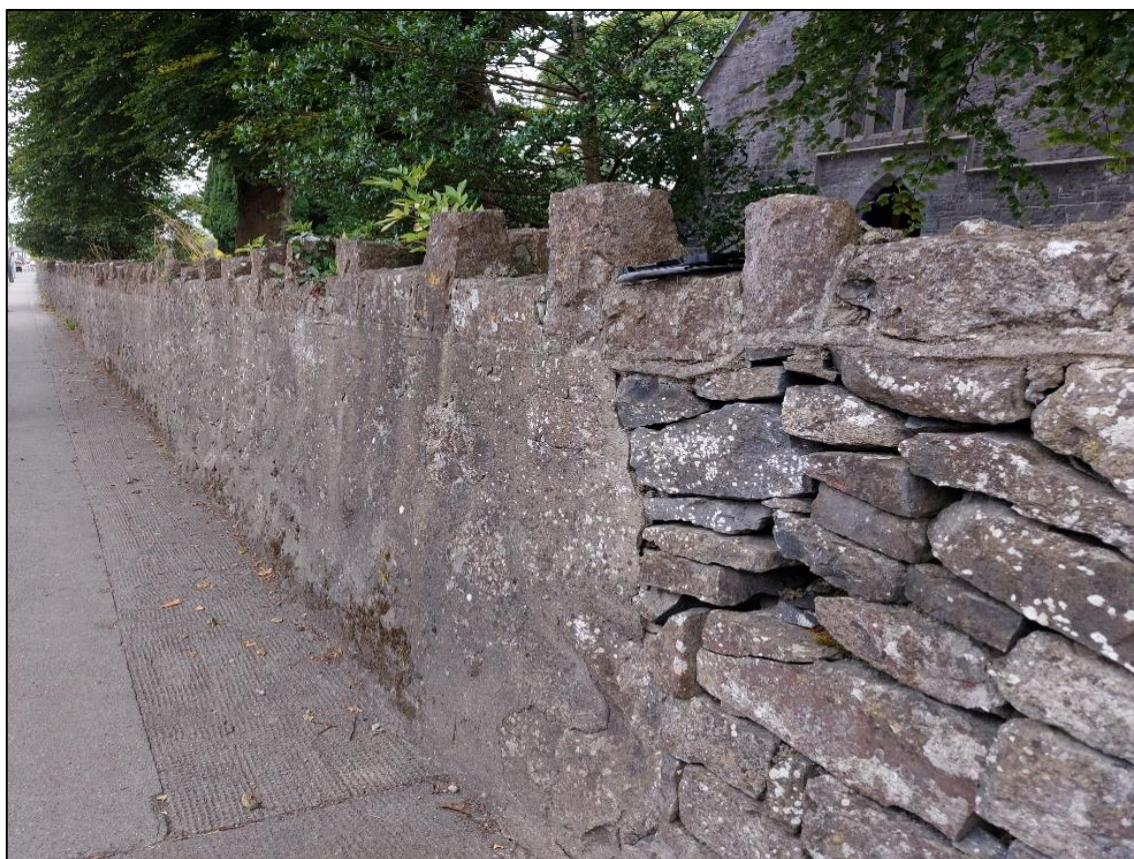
View of boundary wall of Kilcummin Church, facing east.
